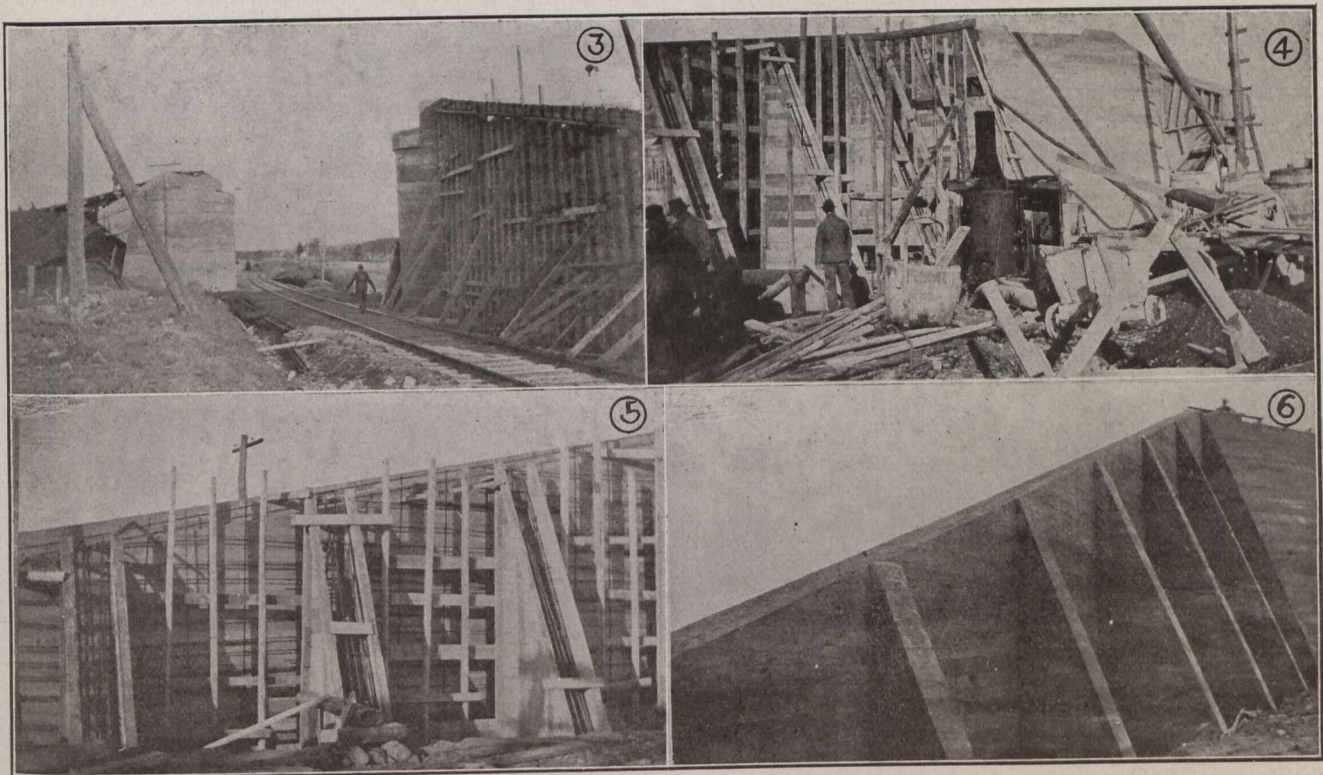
Abutments in place on either side of the C.P.R. line. Figs. 4 and 5.—Formwork and reinforcing of wall ready for concrete. Fig. 6.—Completed wall from counterfort side.
